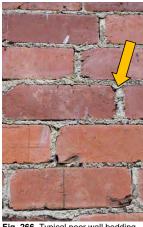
Typical poor wall bedding mortar which has not been struck for a fair-faced pointing finish.
